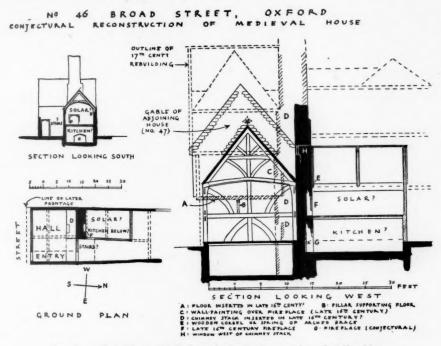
46 Broad Street, Oxford: conjectural reconstruction of medieval house.
